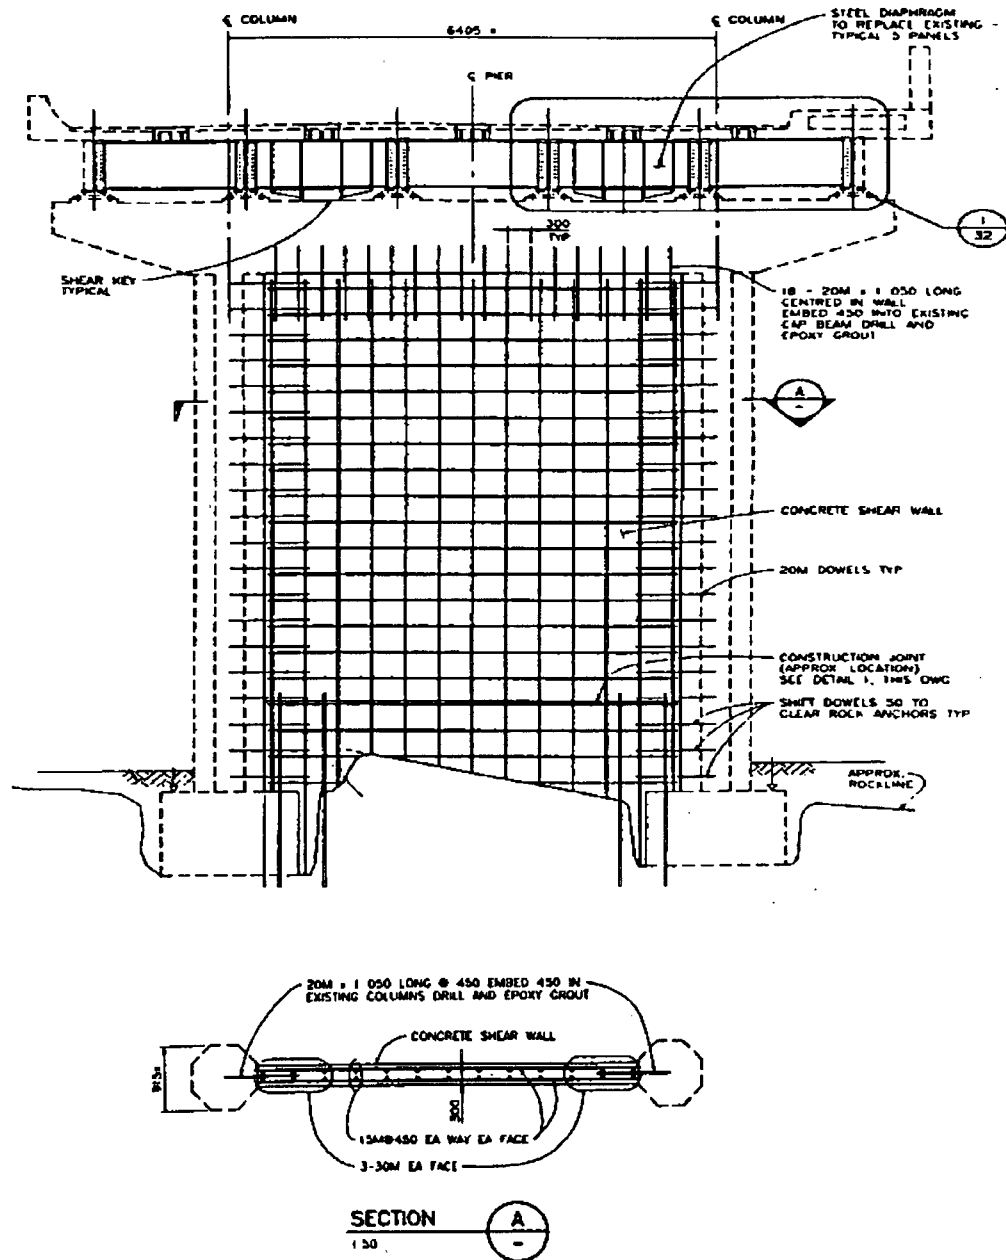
New concrete shear walls to bent 2 and bent 3
